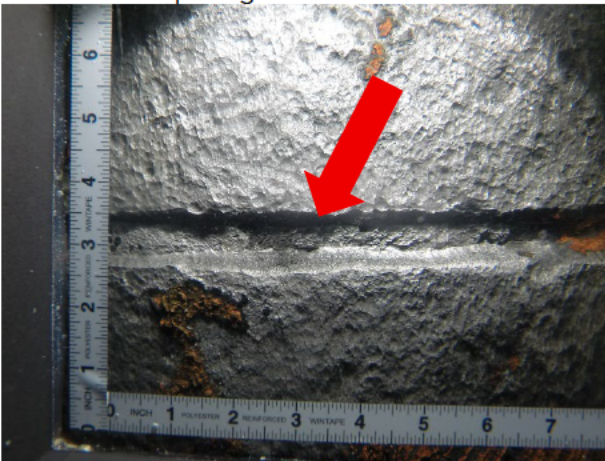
Corrosion of the horizontal weld splice at Pile 62:A.
